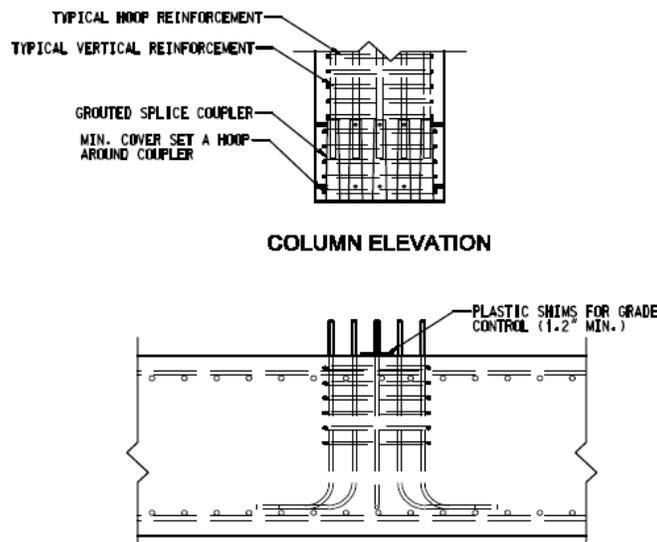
55 Grouted sleeve connection between footing and column [8].
